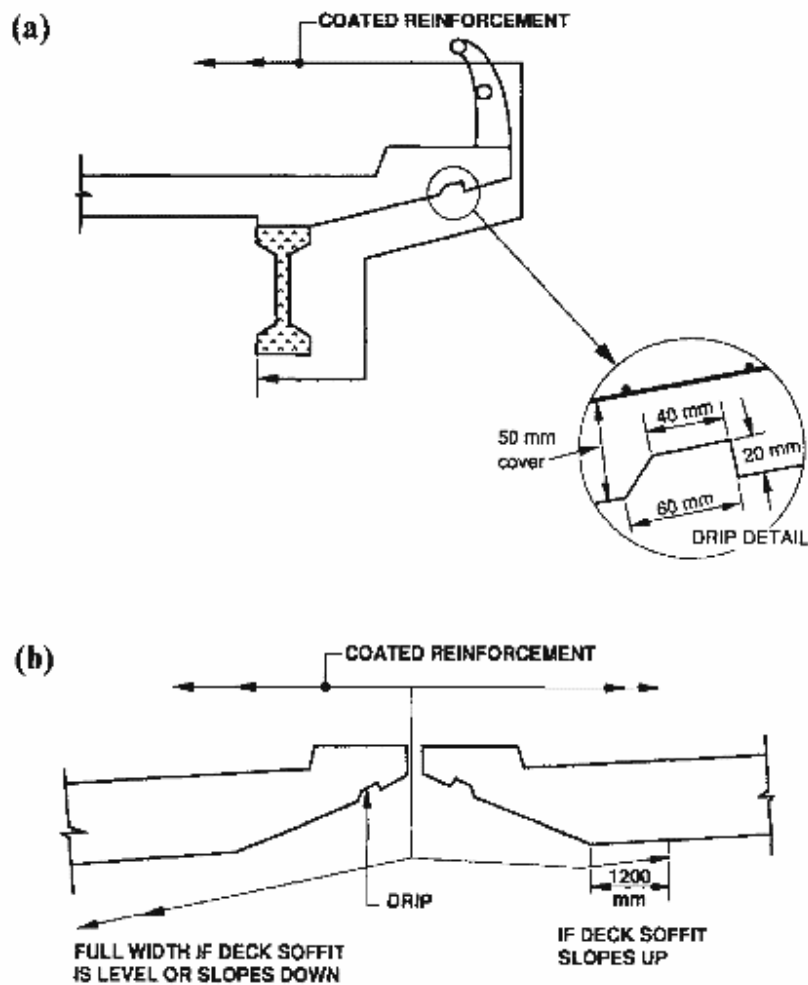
Examples of design details which recognize microclimate effects: (a) concrete girders and slab decks; and (b) thick slabs with or without voids.
